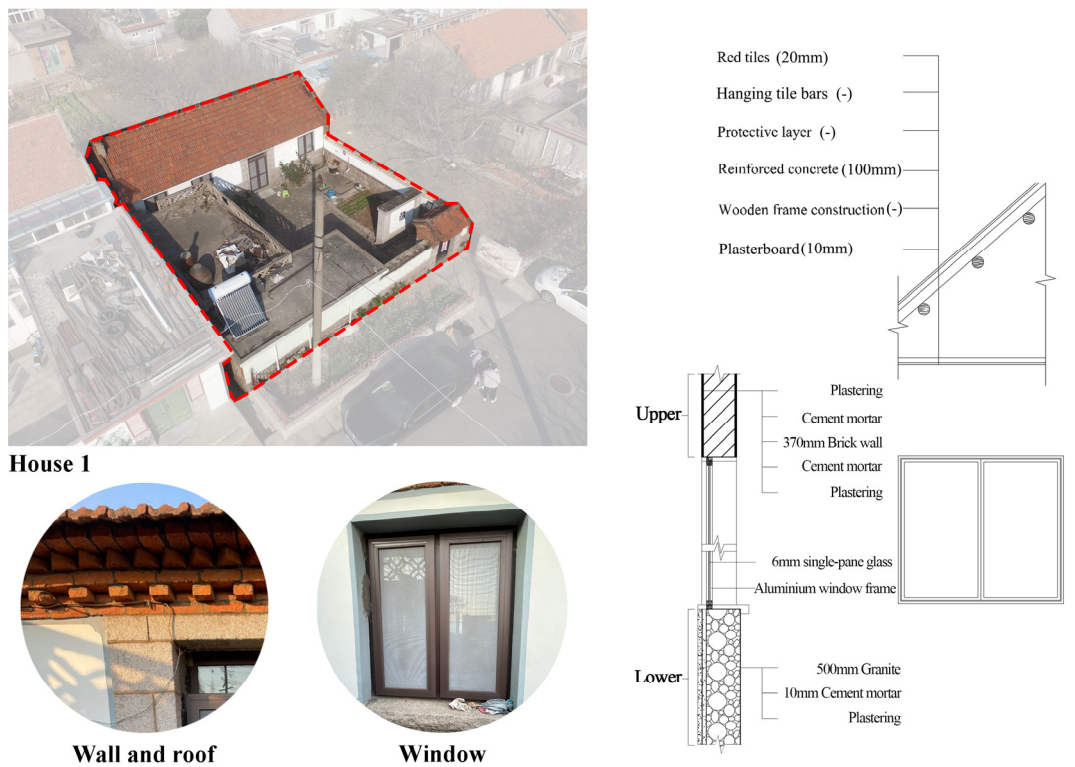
The roof, exterior wall, doors and windows of house 1
